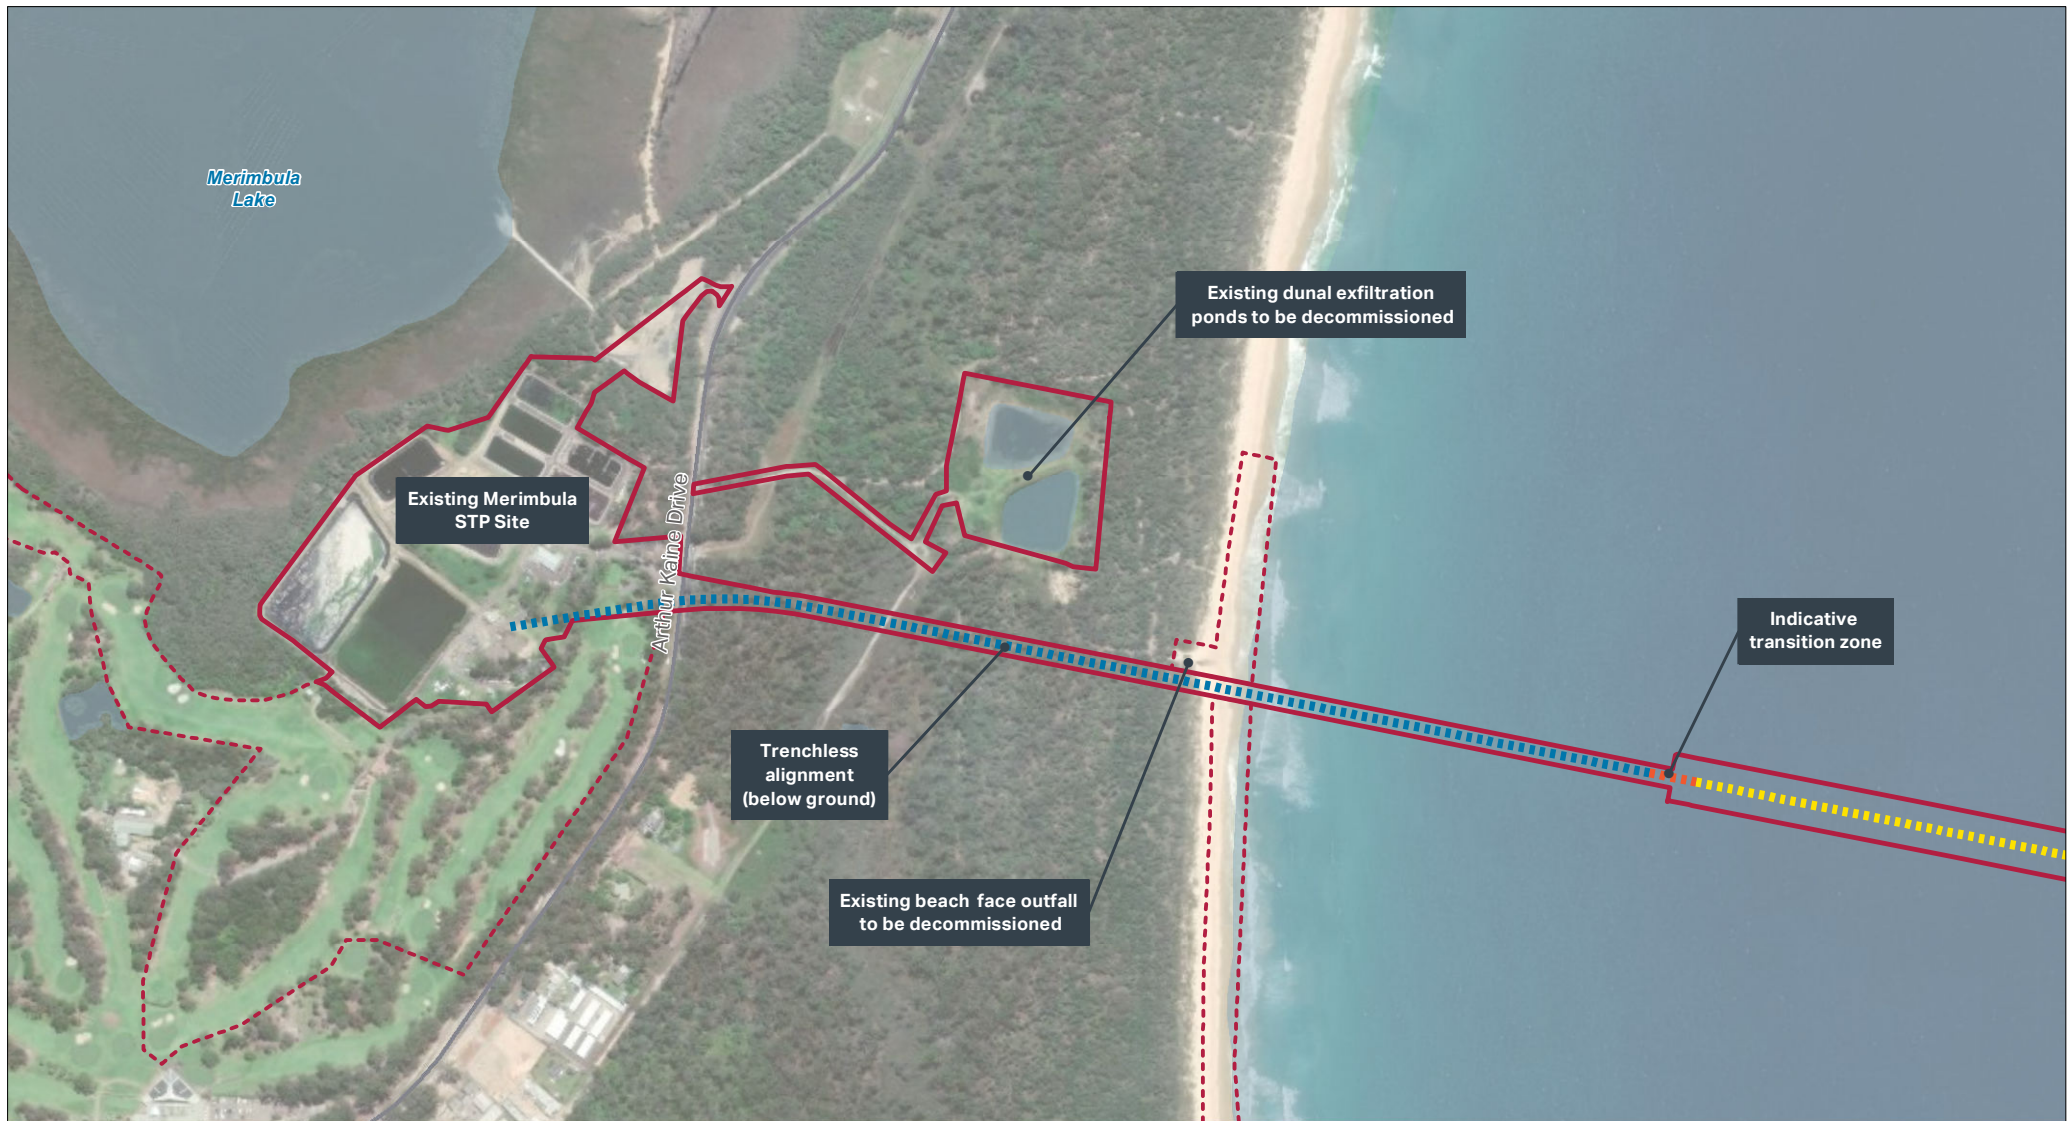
OCEAN OUTFALL PIPELINE - SECTION 1 (BELOW GROUND)
